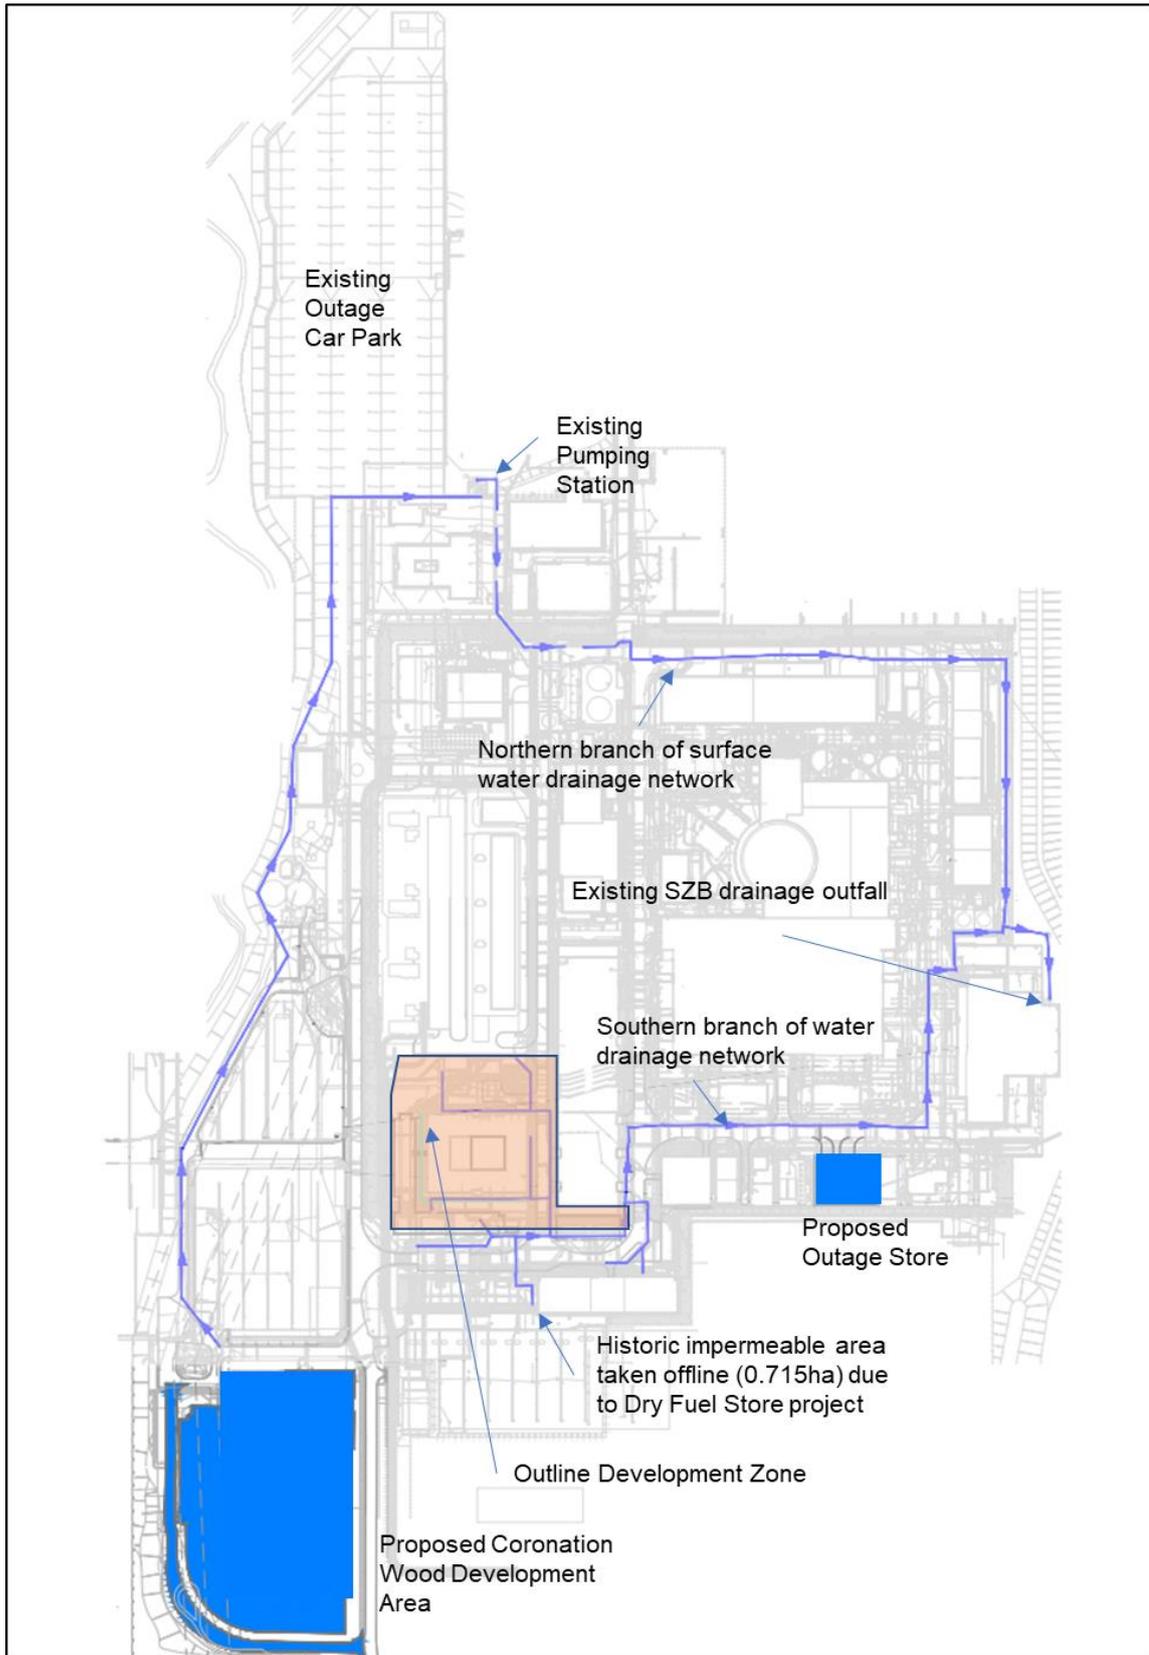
Proposed Facilities (excl. Pillbox Field Outage Car Park)
